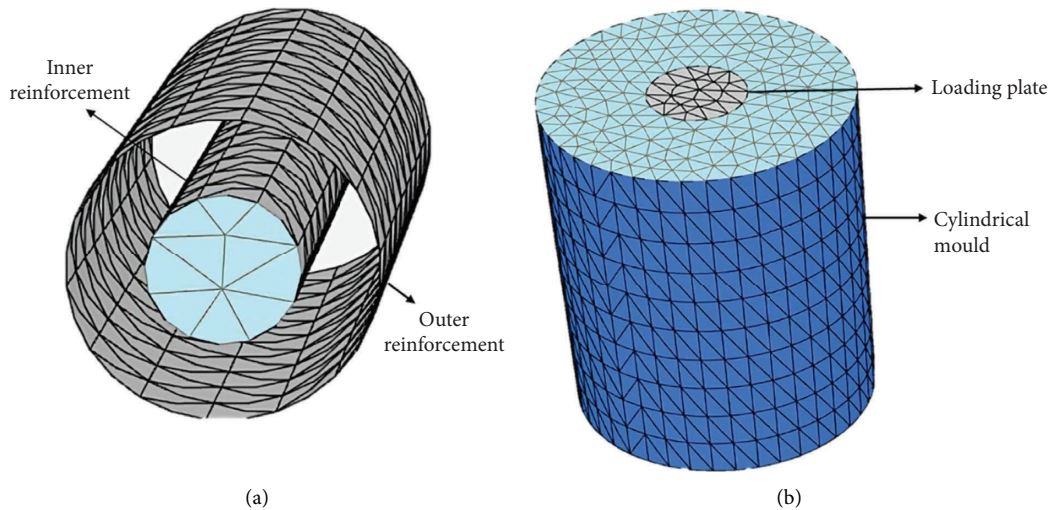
(a) Cross-sectional view of dual-layered encasement for a single stone column and (b) single-stone column setup.
